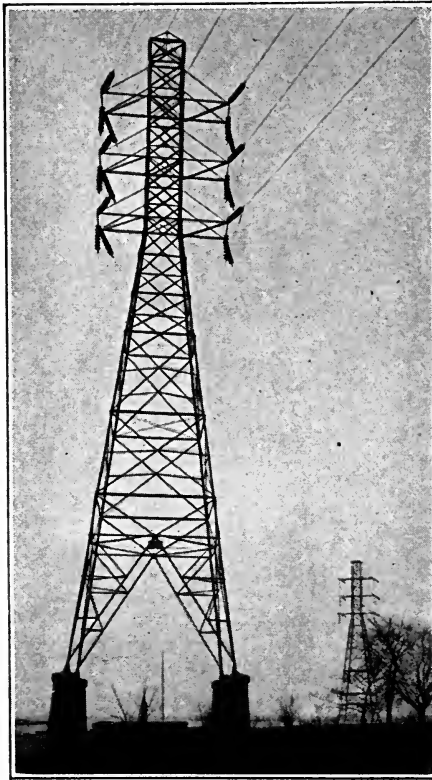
Corner construction—Ontario Hydro-Electric Power Commission lines.
